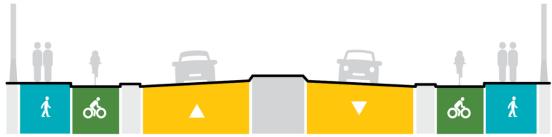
NOR W4 Spedding Road typical Cross section – two lane bridge
